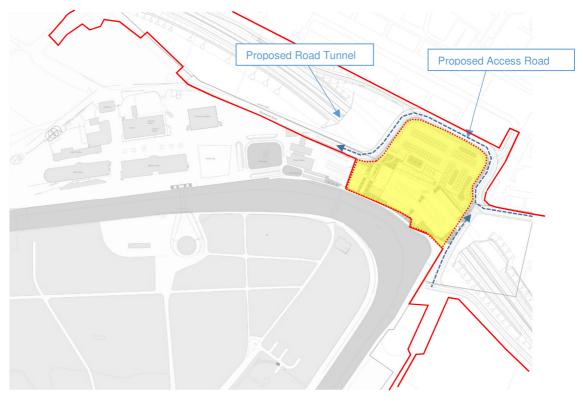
Map Showing Proposed Road Layout Proposed Boundary of N6 GCRR Development Extent of proposed Permanent Stableyard Site
